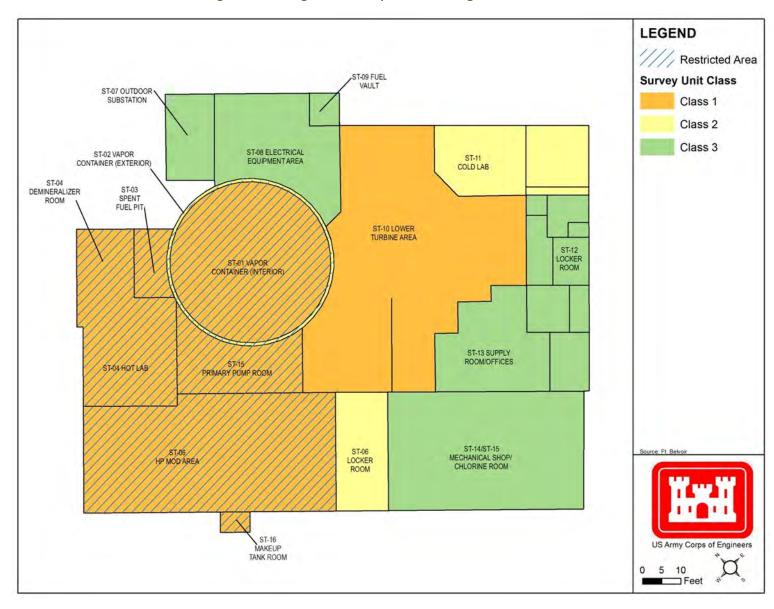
Categorization of Spaces in Building 372-Ground Floor
